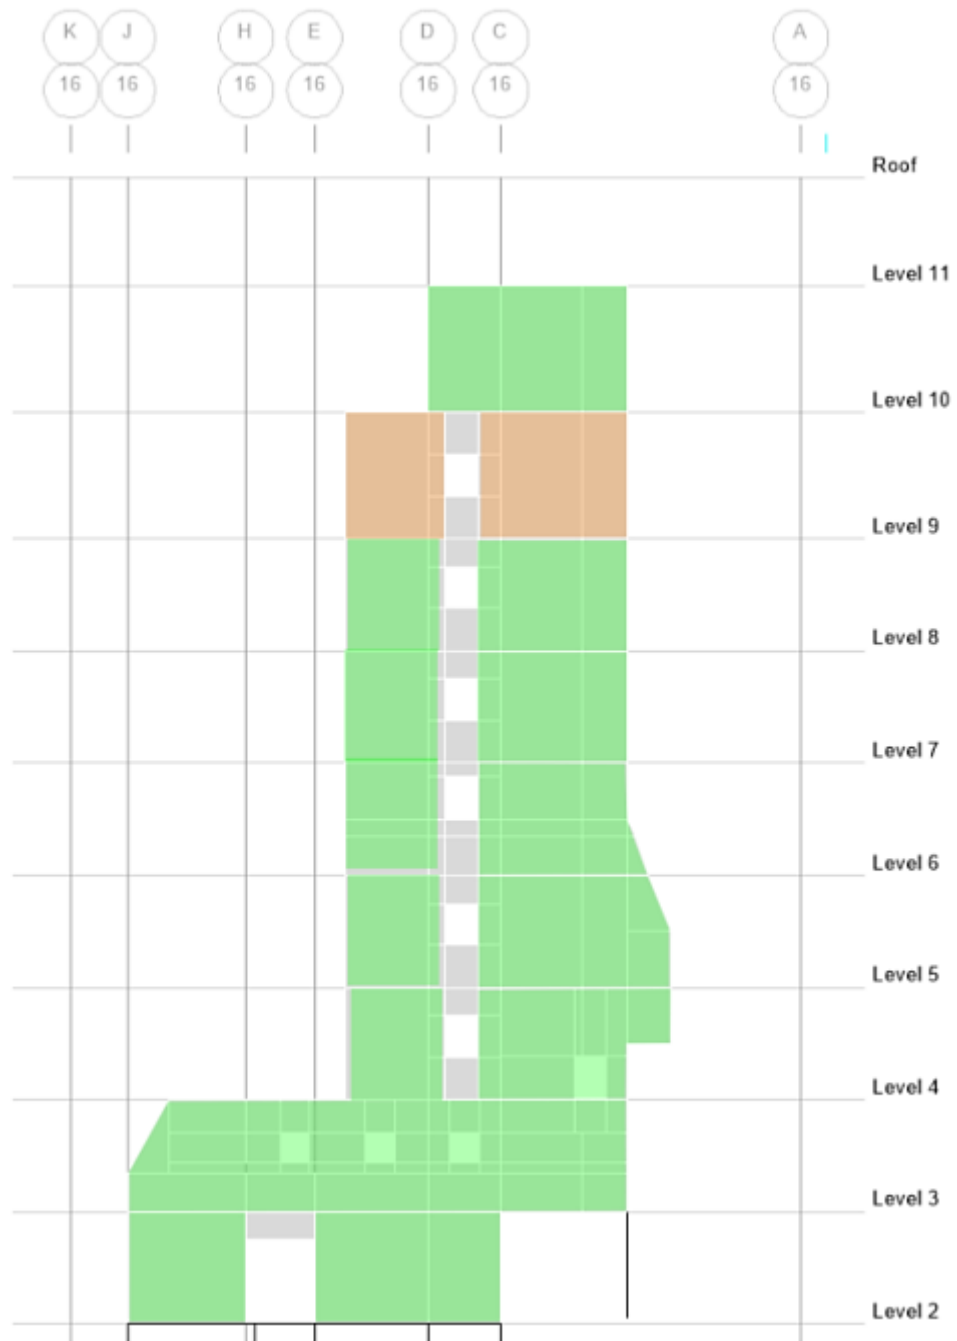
, Gridline 16 Transverse Direction Wall – South Structure
